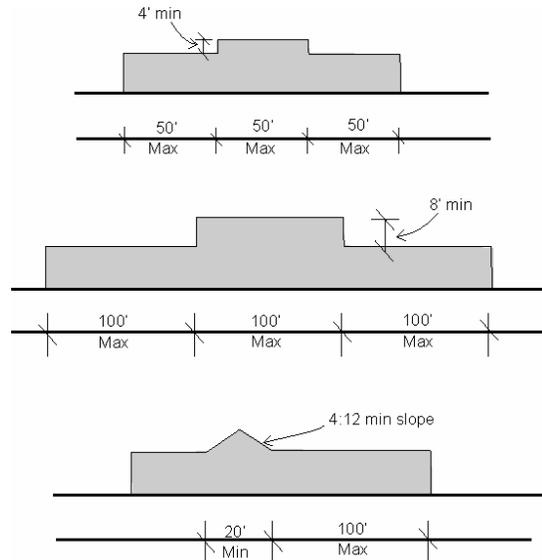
Roofline standards for non-residential and mixed-use buildings.
